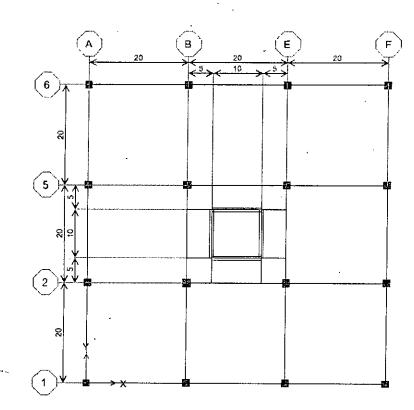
Plan view of ground floor in 20'x20' floor panel model
